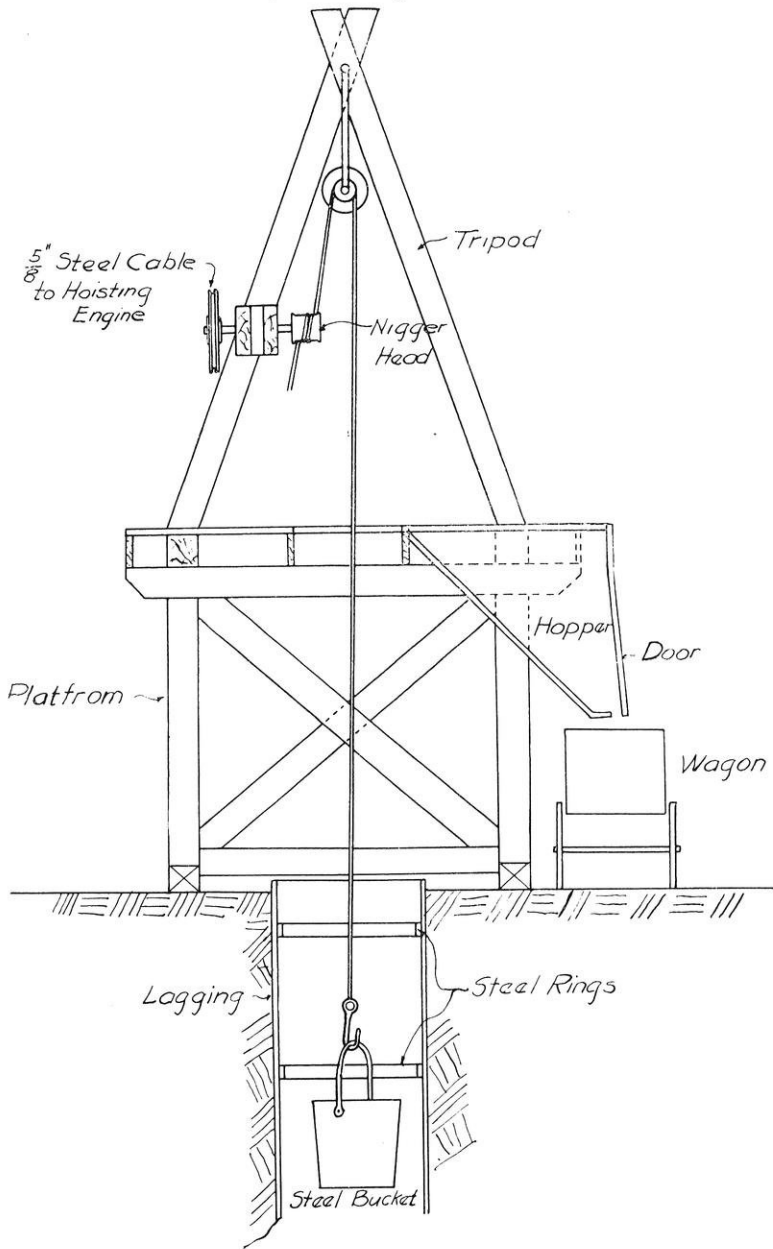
Section Showing Arrangement of Hoist for Concrete Pier Construction.
